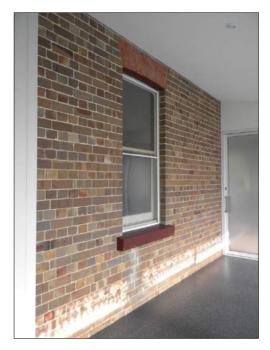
Looking east along the northern verandah. Figure 29: Detail of the window in the northern elevation.
